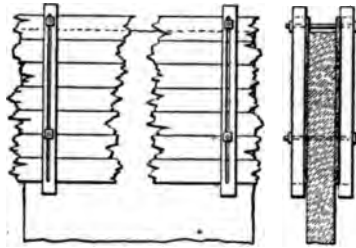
Wall Forms Used in Ransome System of Construction.
